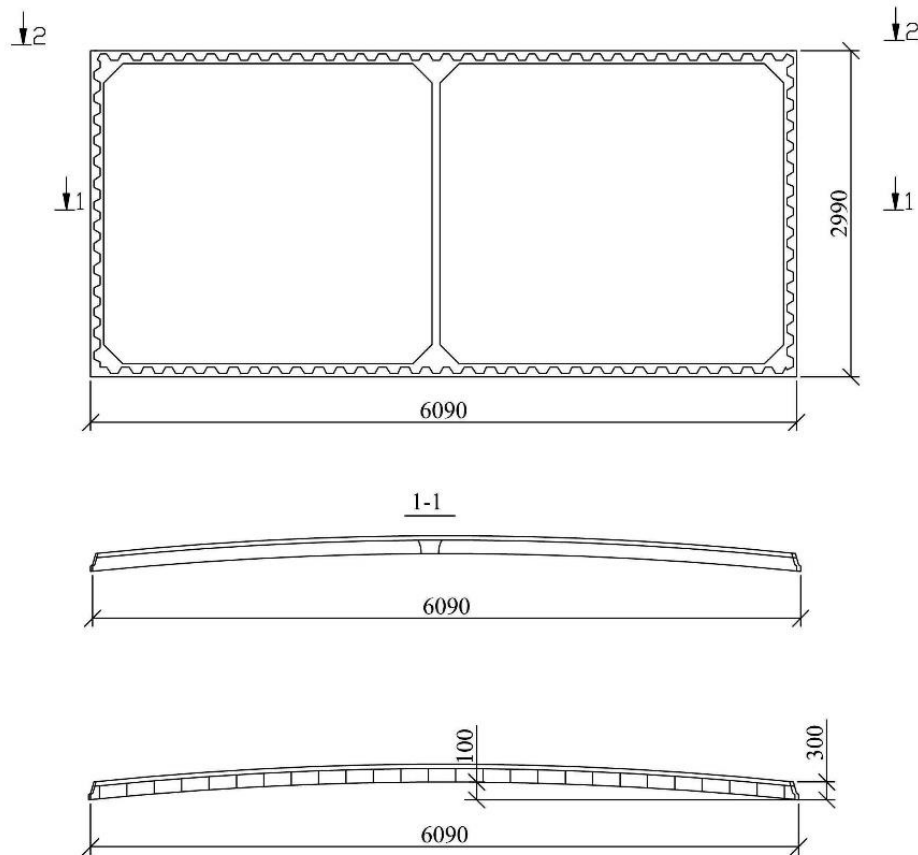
Cylindrical reinforced concrete slab 3.0×6.0 m
